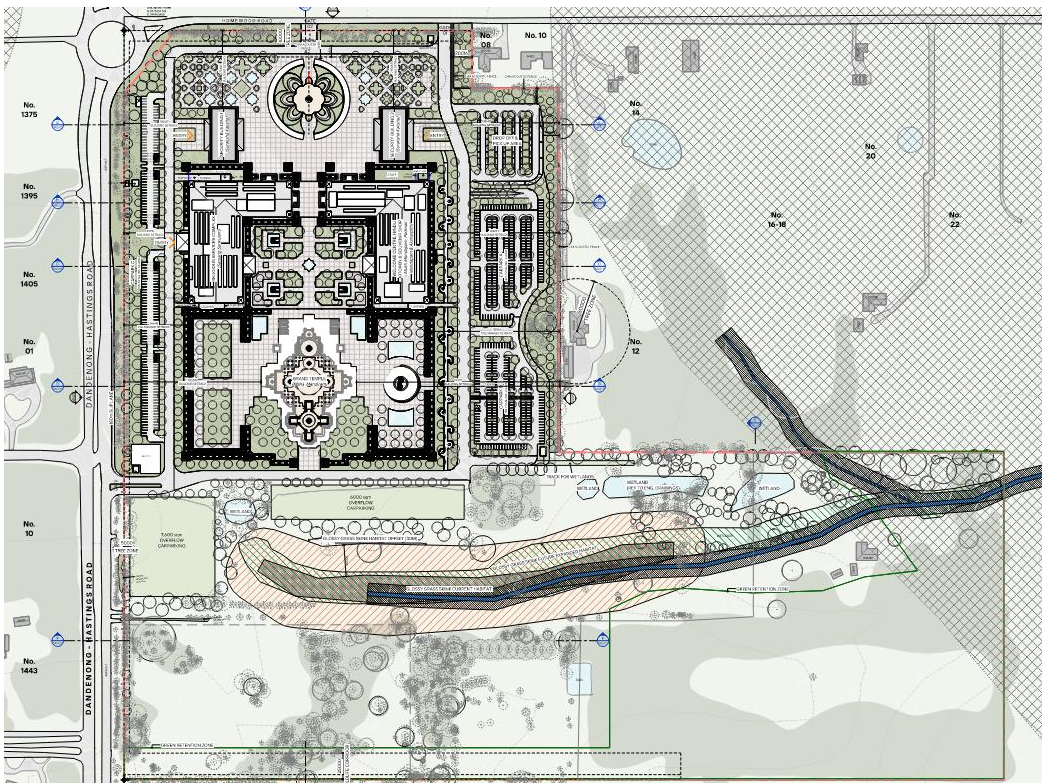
SITE PLAN (SOURCE: ARCHITECTURAL DRAWINGS BY PTA)
